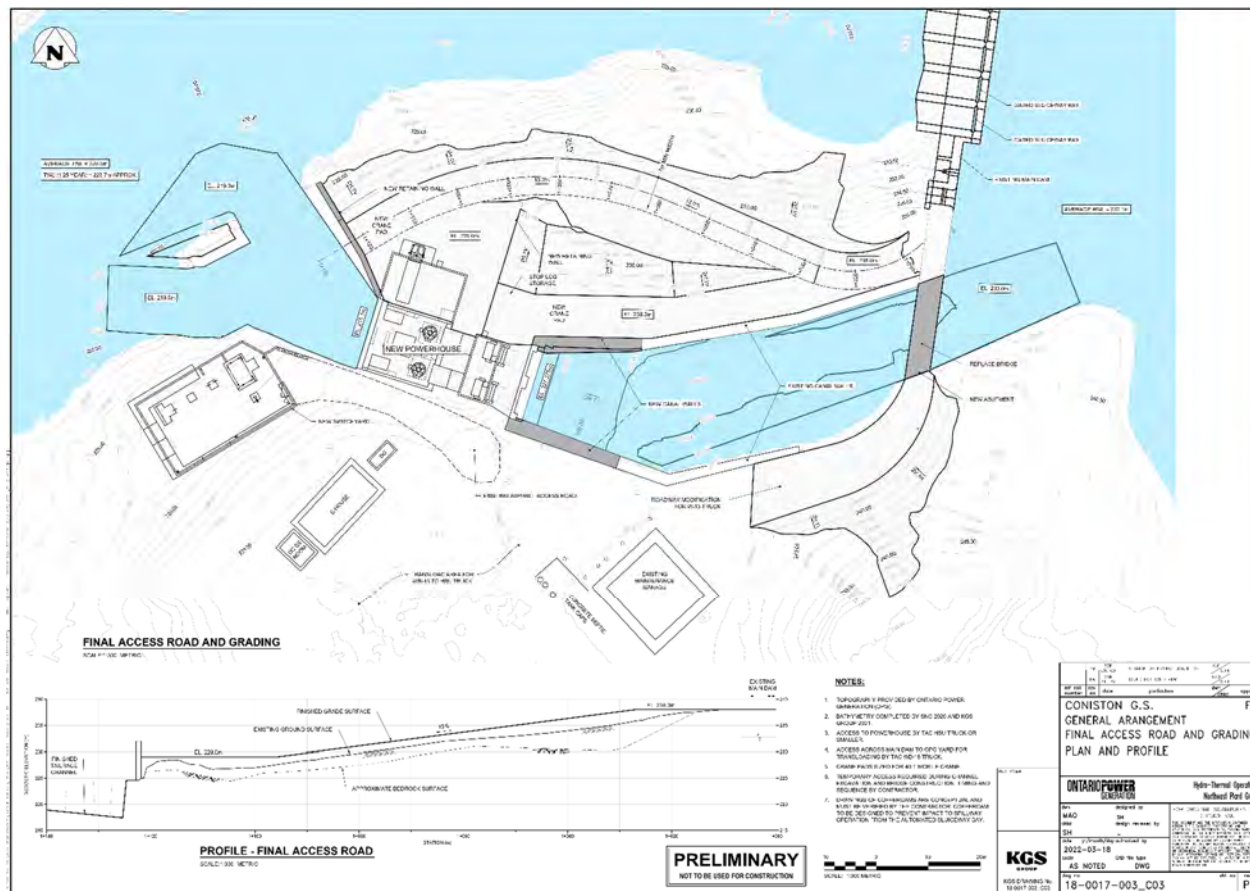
Proposed Powerhouse Arrangement Final Access Road and Grading Plan and Profile
